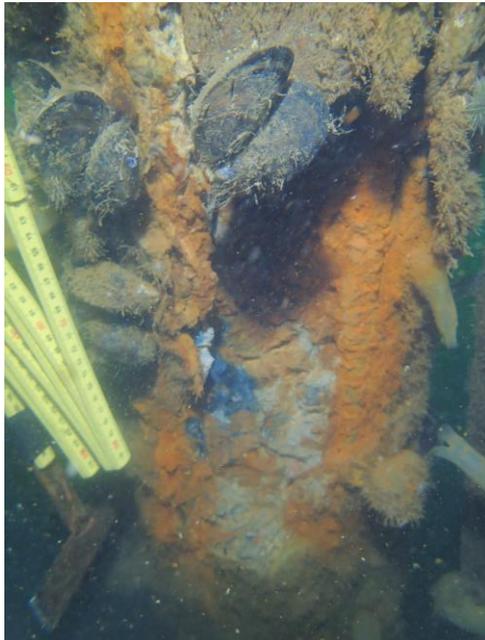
Spalled concrete and exposed corroded reinforcement (Robert Klein)
